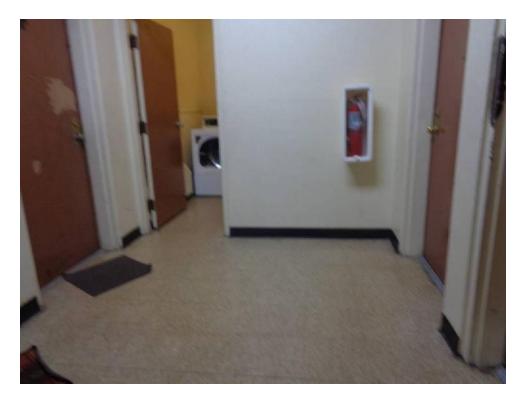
View of beige floor tile (FTA, non-asbestos) from the second floor hallway and laundry room of 9845 Oak Place Court common area.
